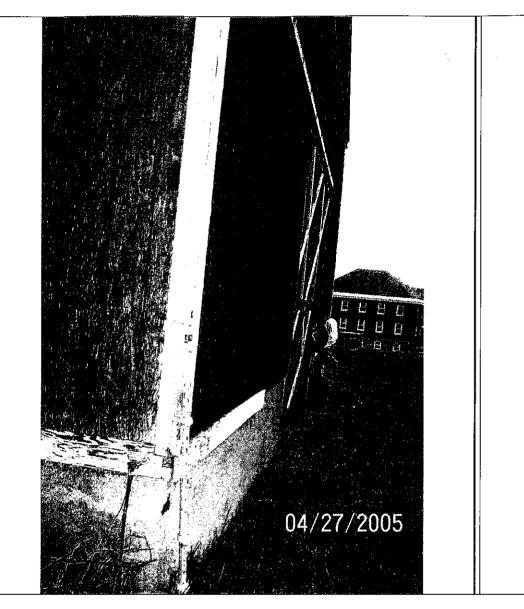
04/28/05 - Root Cellar (Building #4): Retaining wall #2 is unstable
